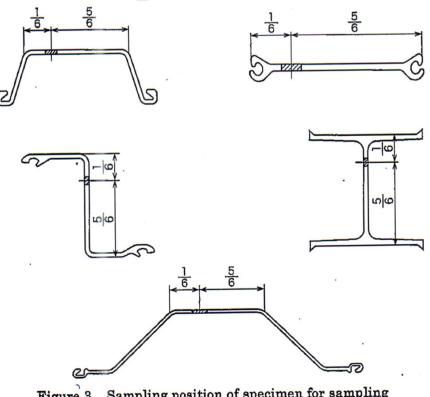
Sampling position of specimen for sampling tensile and impact test piece
